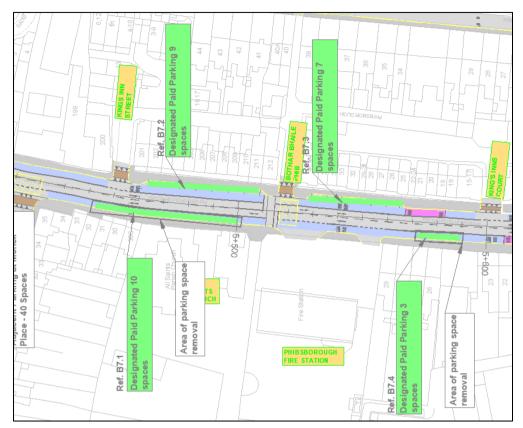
Proposed scheme design and parking changes along Phibsborough Road (Between Monck Place and King Street North)
